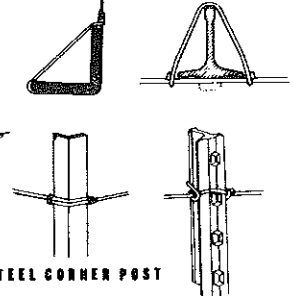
DETAIL FOR TYING FENCE TO WINGS OF ABUTMENTS
